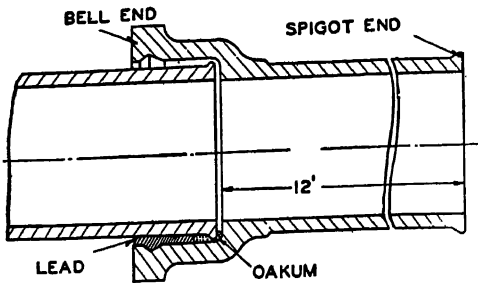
Cast Iron Pipe with Bell-and-spigot Joint.
